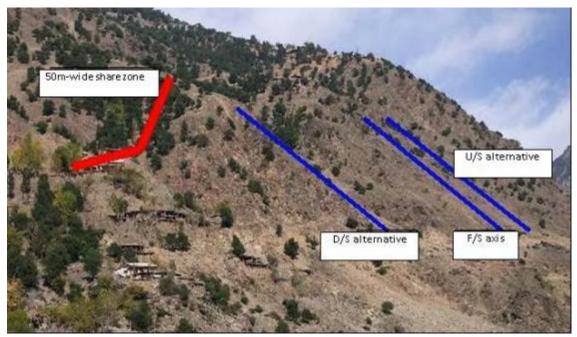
Alternatives for Dam Site Location in Detailed Design
